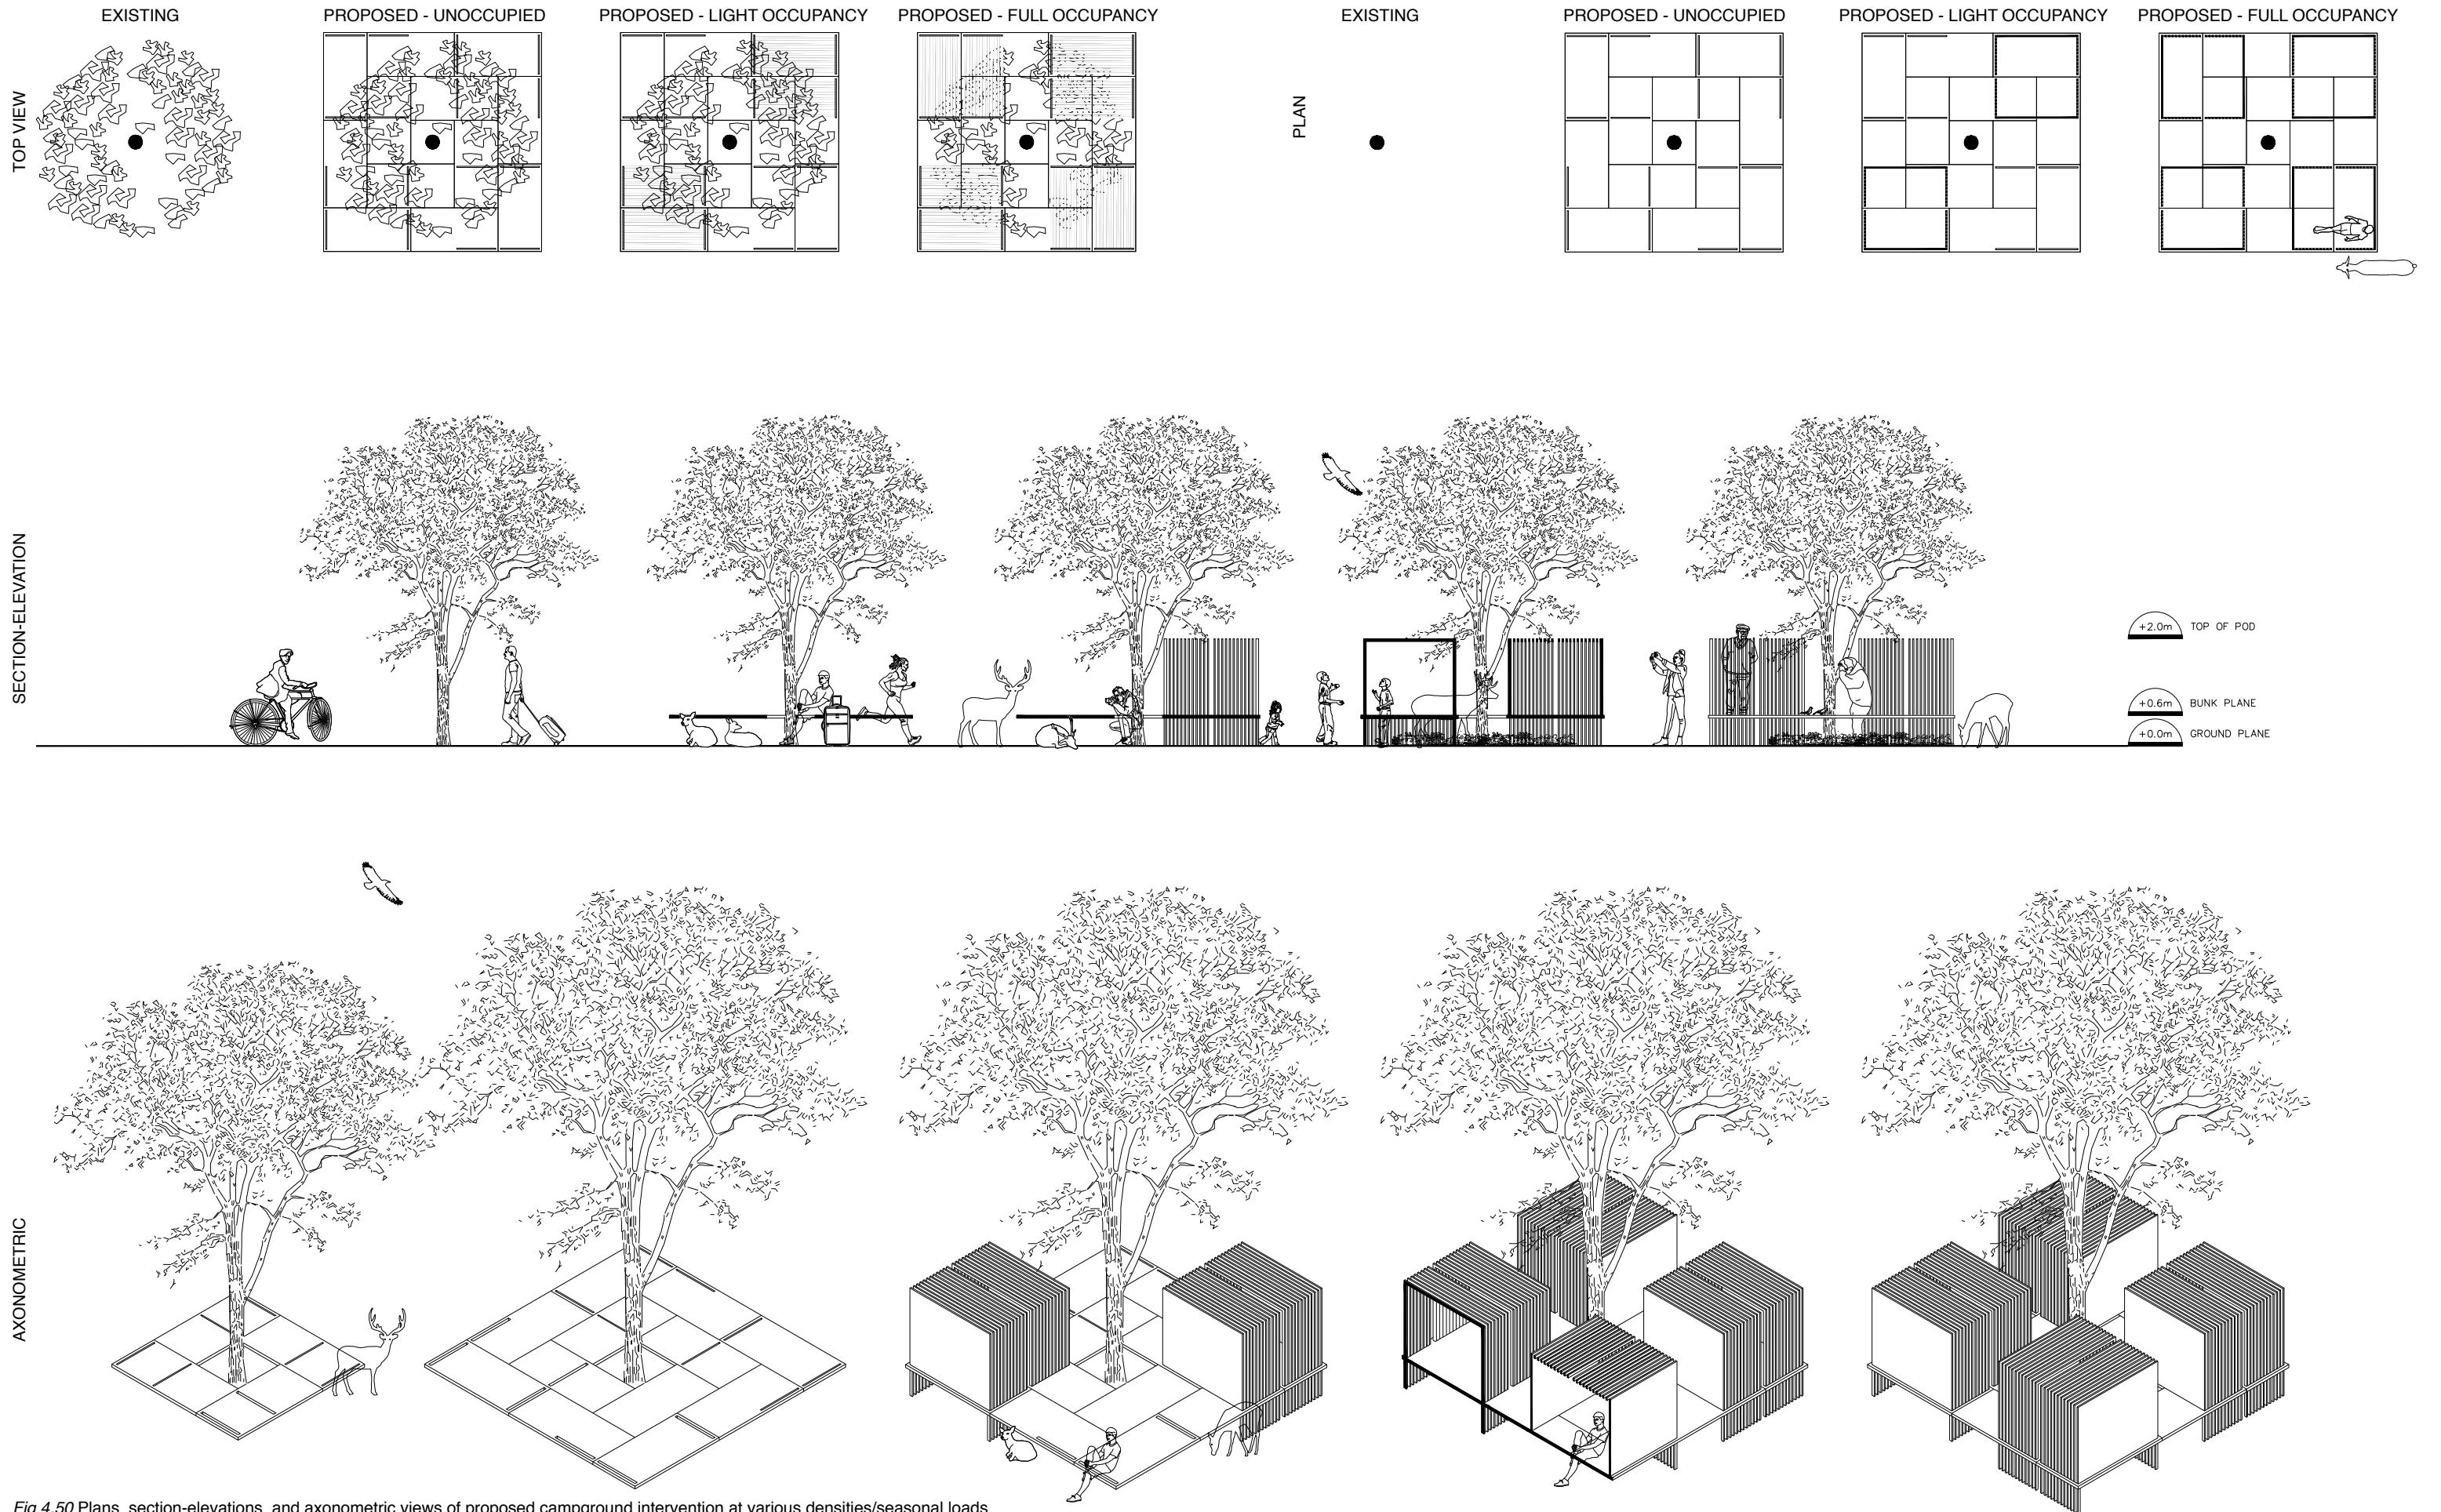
Plans, section-elevations, and axonometric views of proposed campground intervention at various densities/seasonal loads.
